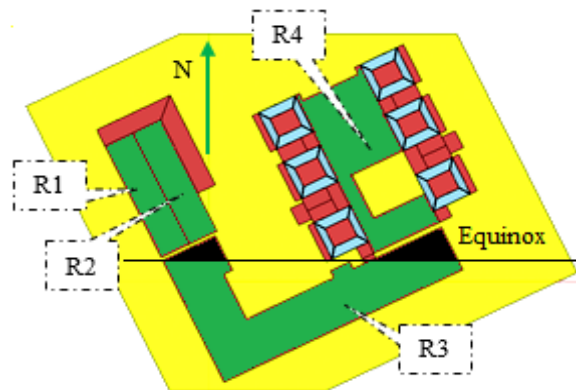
Net roof surface for PV panel installation on the Roof 3
